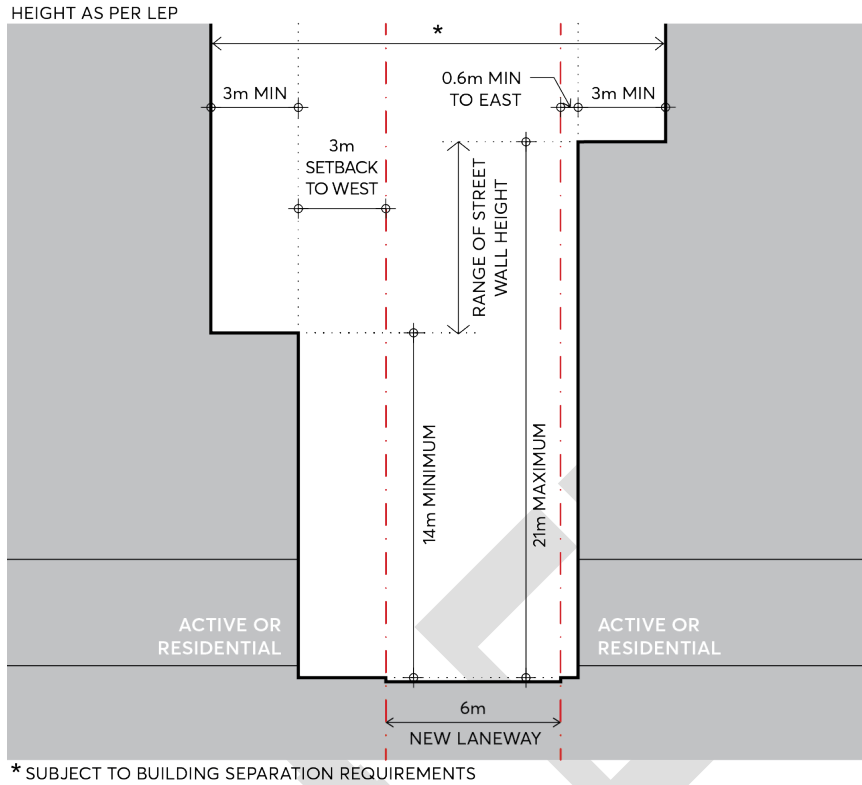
New North-South Laneway (Section E) Setbacks and Street Wall Height
